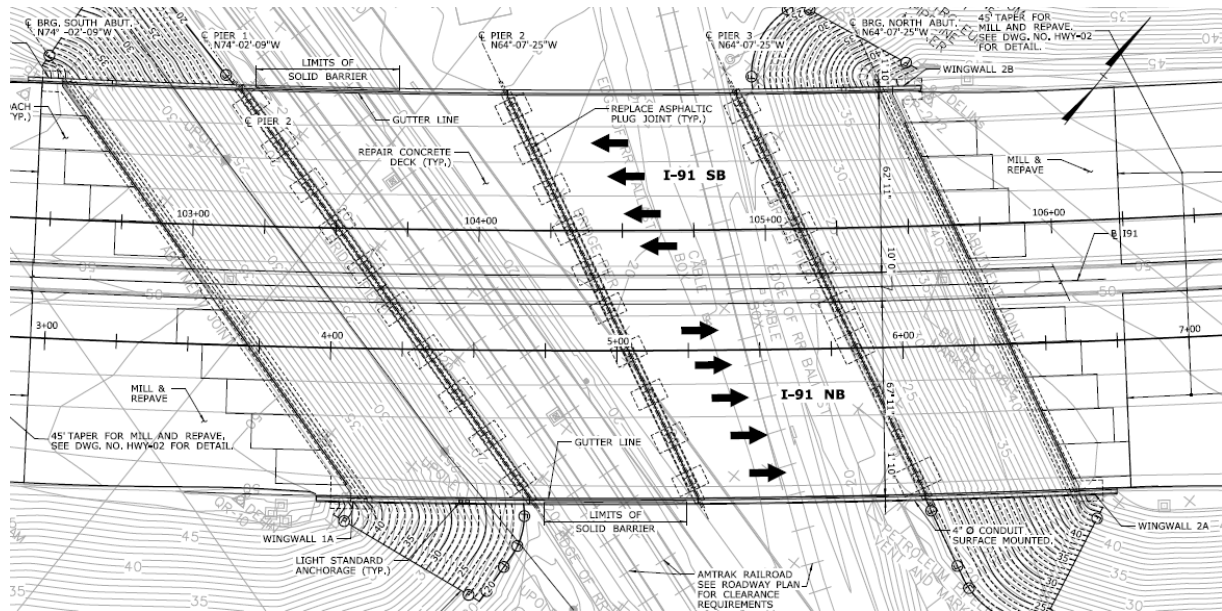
General plan view of bridge in New Haven, CT scheduled to undergo UHPC repair at beam ends.
